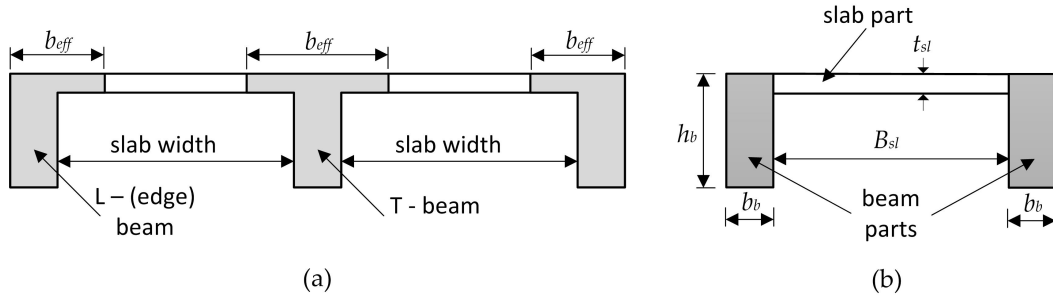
(a) Effective beam width (b_{eff}) in edge or interior beams, (b) beam and slab parts for the calculation of the moment of inertia of floor cross section
